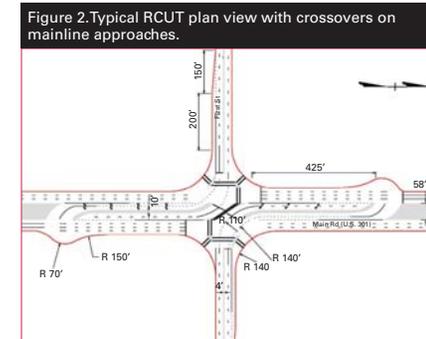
Typical RCUT plan view with crossovers on mainline approaches.
